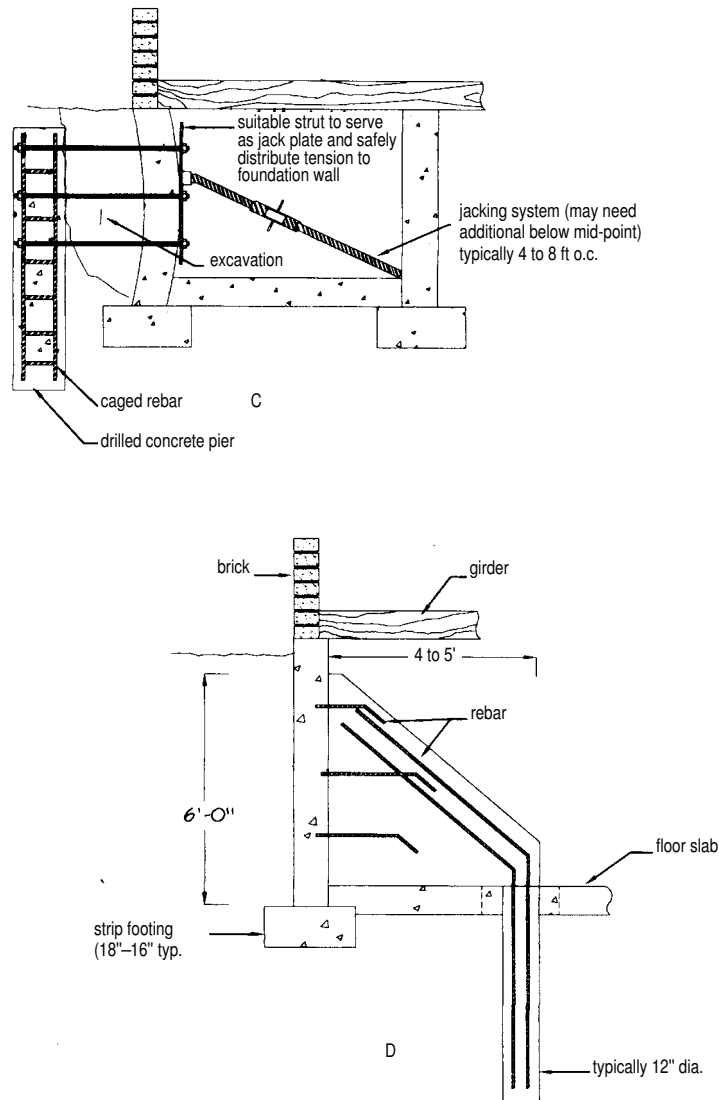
B.5.1. (continued). Basement/foundation wall repair. (c) Failure of basement wall, plumbing desired; (d) knee brace to control rotation.
